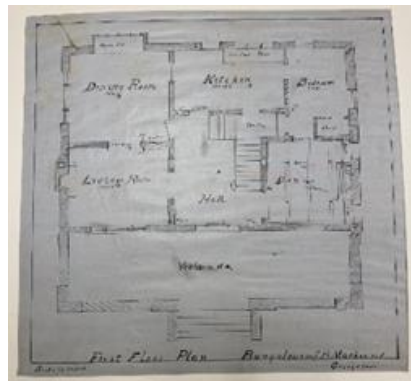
First Floor Plan, The Birches, 75 Mill Street (EHS ARCHIVES MG12 C6 #44)
